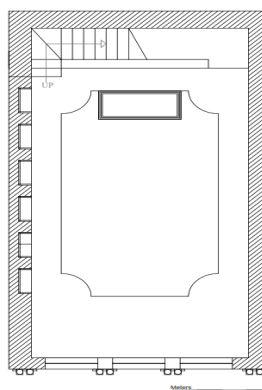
First Floor Plan – Gurudwara Guru Singh Sabha
